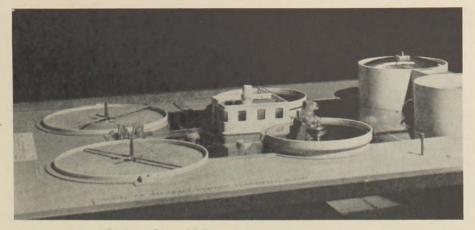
Two-Stage Biofilter Plant Model, built for the Corps of Engineers of the Army, Construction Division, Repairs and Utilities Branch.
